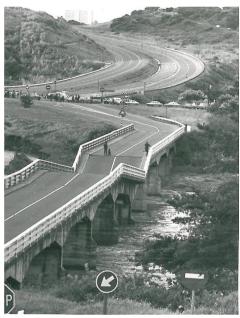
Caissons failure due to bed erosion (Frankipile, 2008)
